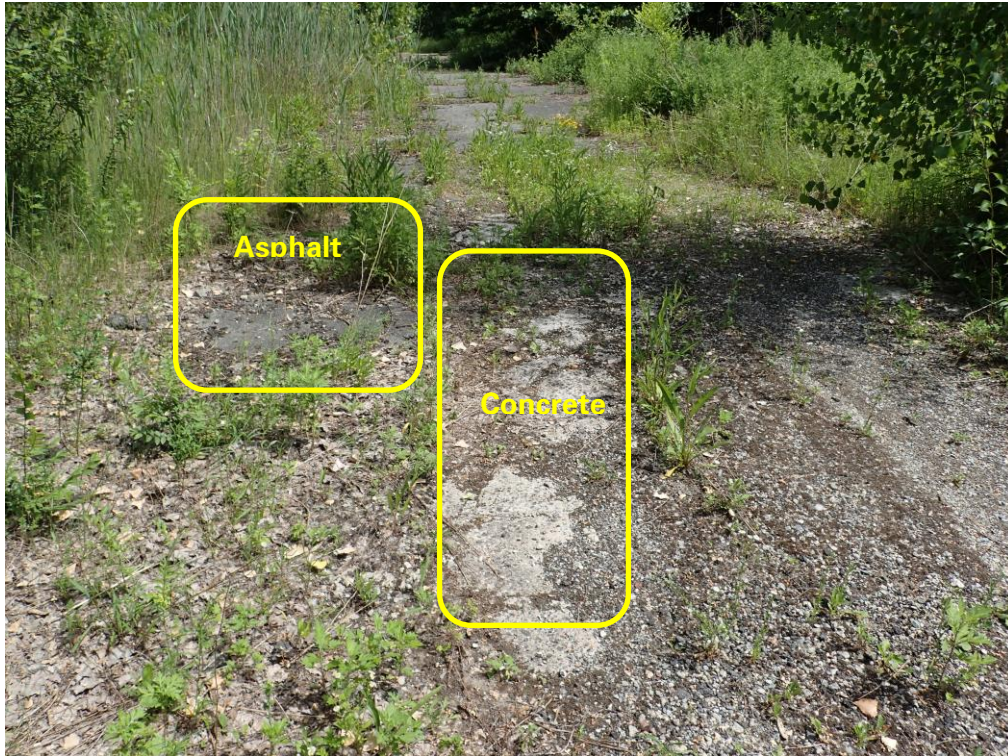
Concrete pavement adjacent to shoreline escarpment, looking south. Note asphalt patch on the left.
